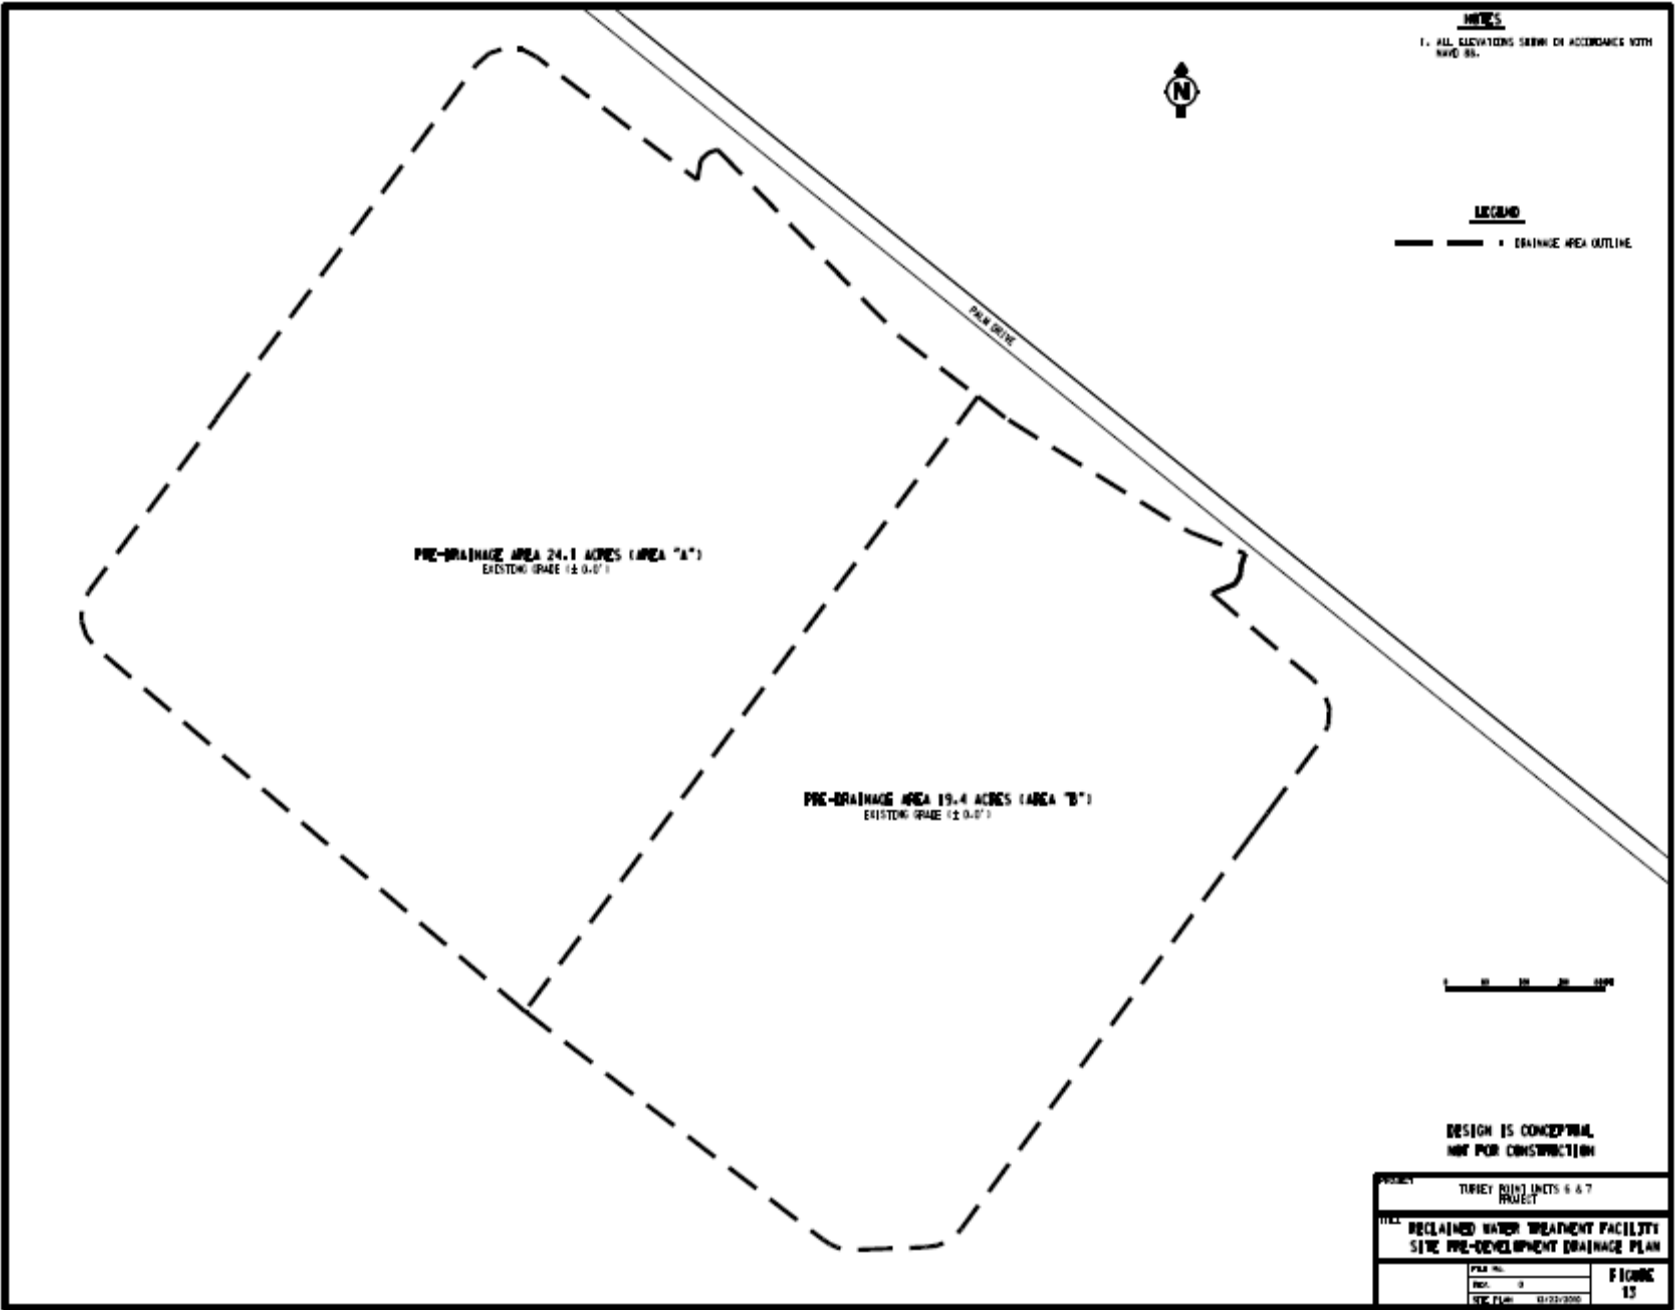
Turkey Point Unit 6 & 7 Reclaimed Water Treatment Facility Existing Condition Drainage Plan
